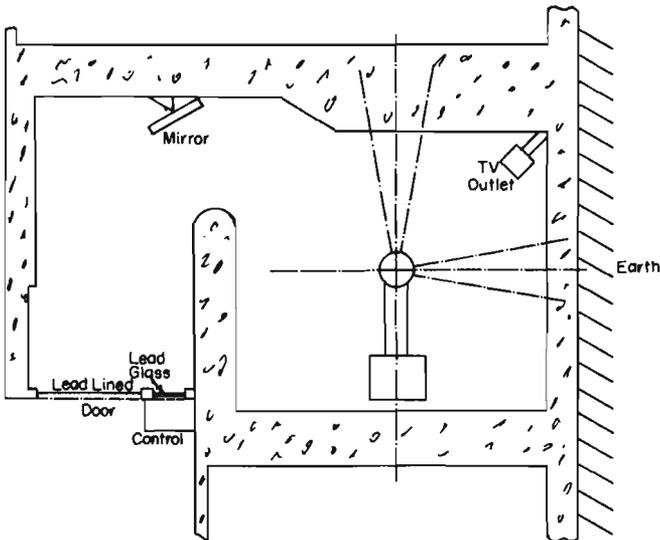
Typical maze design for megavoltage therapy installation. The door and window are exposed only to radiation which has been scattered at least twice.
